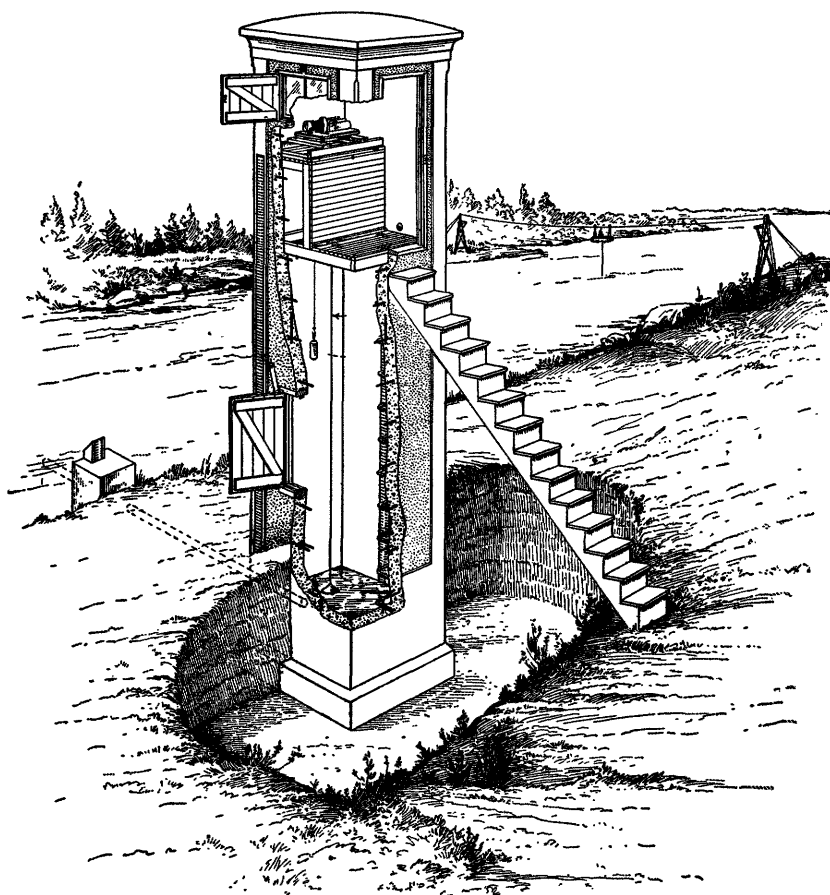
Typical river-measurement station showing concrete well and house for water-stage recorder and staff gages, cable, and car
